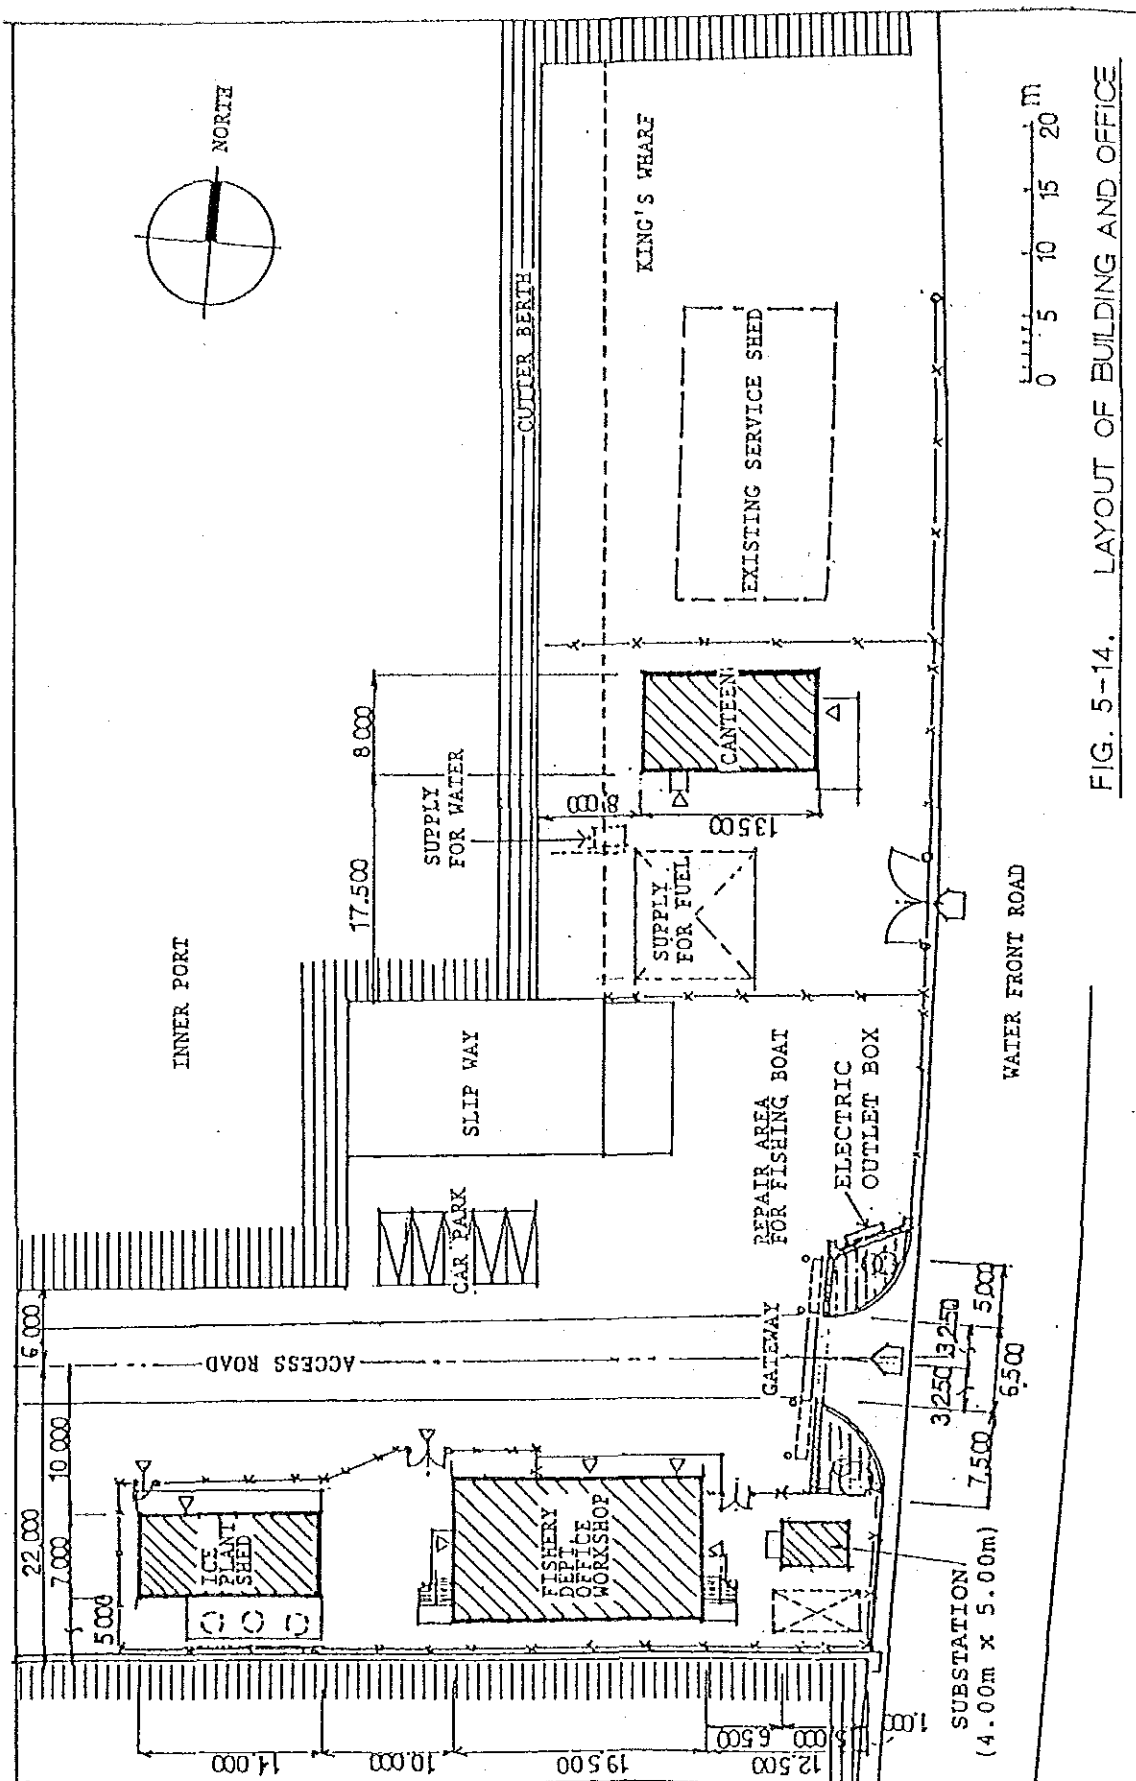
LAYOUT OF BUILDING AND OFFICE
